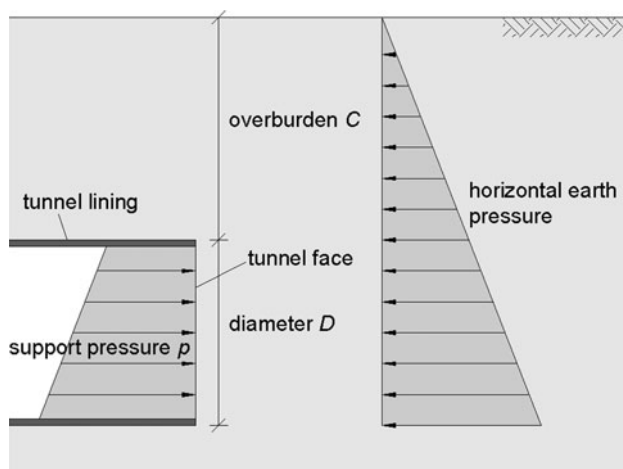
Sketch of simplified stress condition at excavation face: face support pressure, p , balancing the horizontal earth pressure ensuring stability at excavation face (linear increase in earth pressure assumed)
